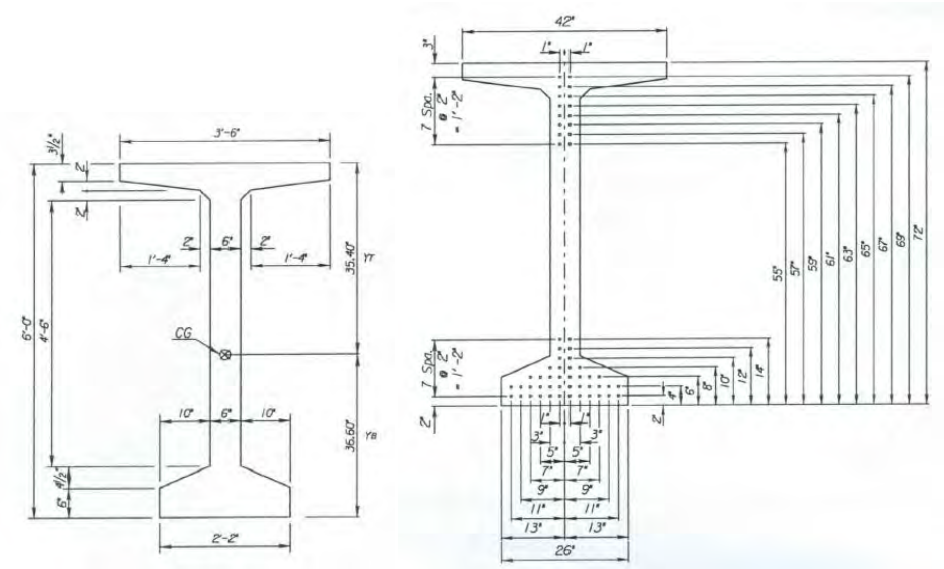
K-6 girder geometry and strand layout (KDOT 2016)
